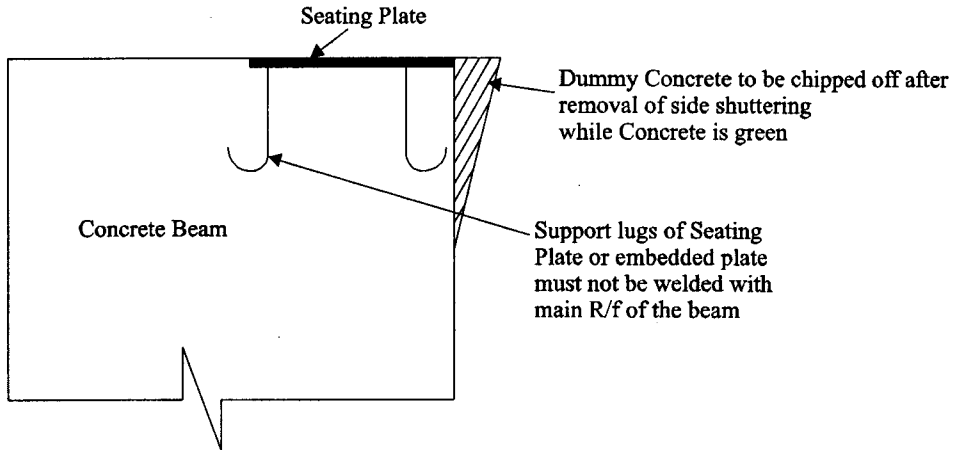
Sketch showing dummy concrete for proper embeddement of Seating Plate located abutting to beam edge
